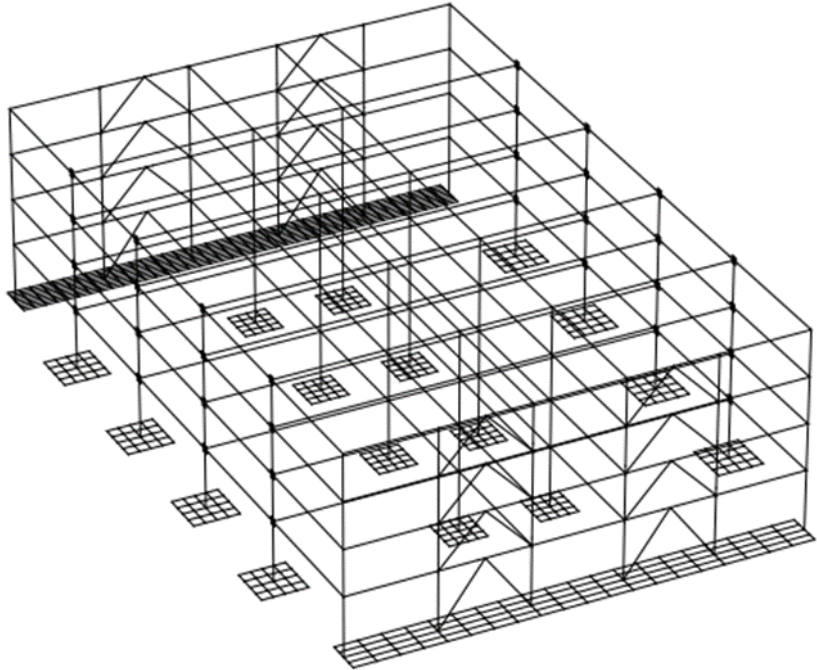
Plan view of the 4- and 8-story foundation system.
